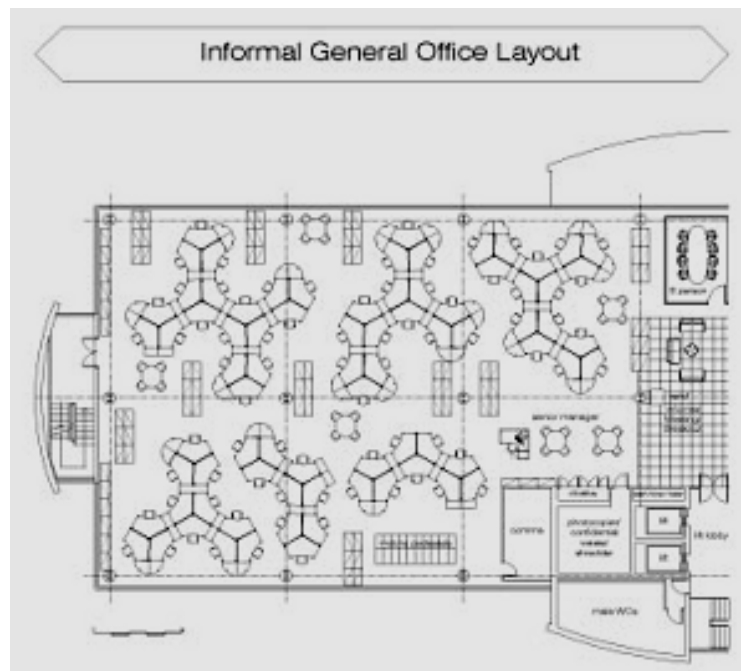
Sample of the Arrangement of the Informal Open Plan Layout
